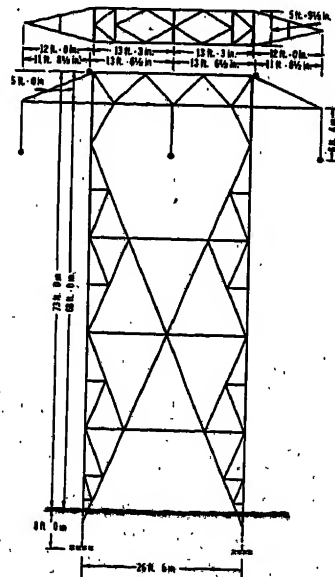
OUTLINE STANDARD SINGLE-CIRCUIT SUSPENSION TOWER
